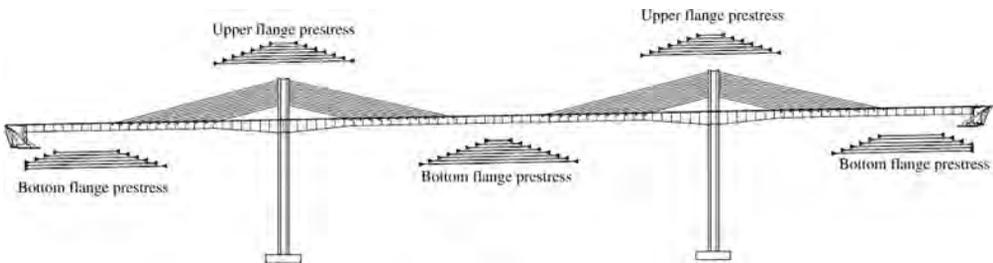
Cantilevering tendon layout of Extradosed Bridge
